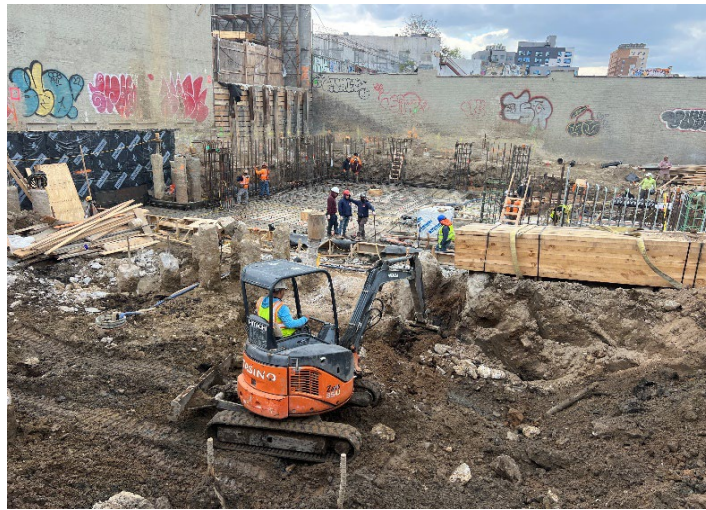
The excavator loading soil/fill from grids WC-03 and WC-04 onto a truck sent for off-site disposal.
